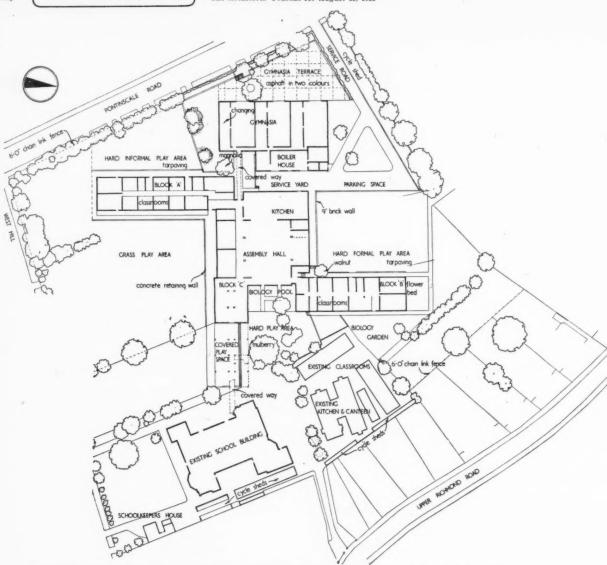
Layout plan of new buildings showing relationship between Assembly Hall and Gymnasia blocks and the three classroom blocks.
